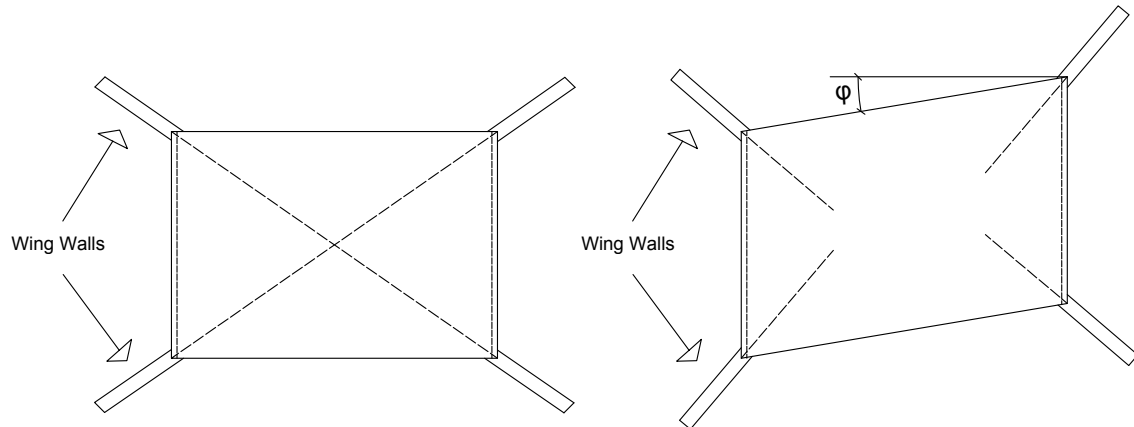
Top-view over wing-walls parallel to the bisection of the slab for a straight slab frame bridge (left) and for a skewed slab frame bridge (right).
